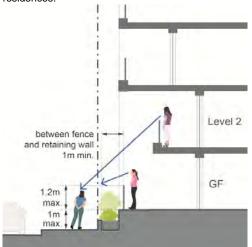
Front fences are to be set back from retaining walls by a minimum of 1 m.
